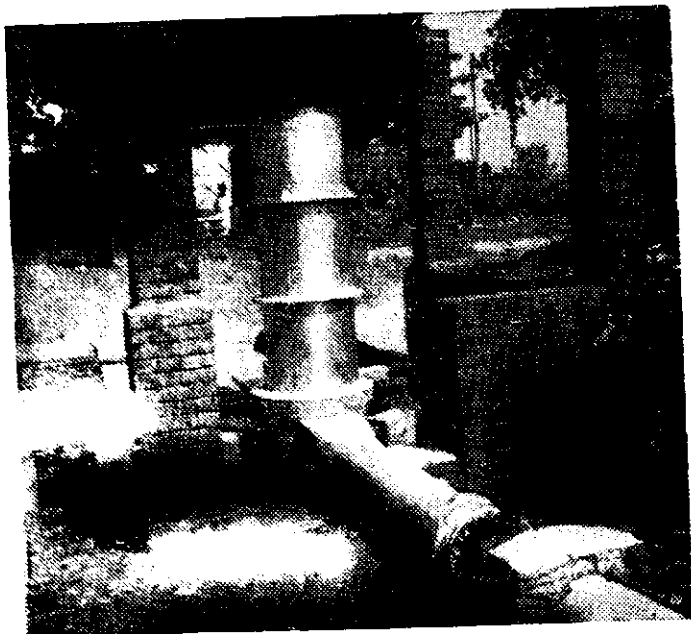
(Chap 14): View of surge tank looking downstream showing entry of tunnel and friction disc.
